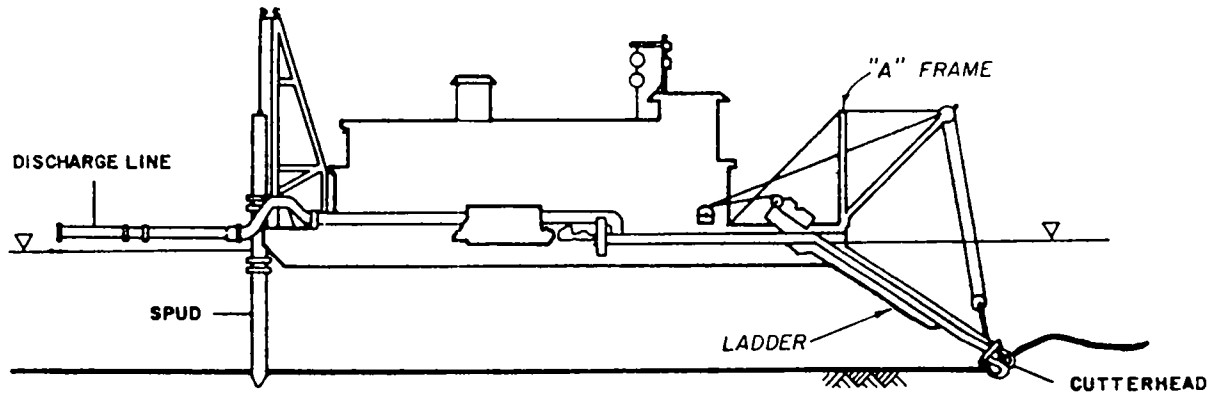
Hydraulic Pipeline Cutterhead Dredge
